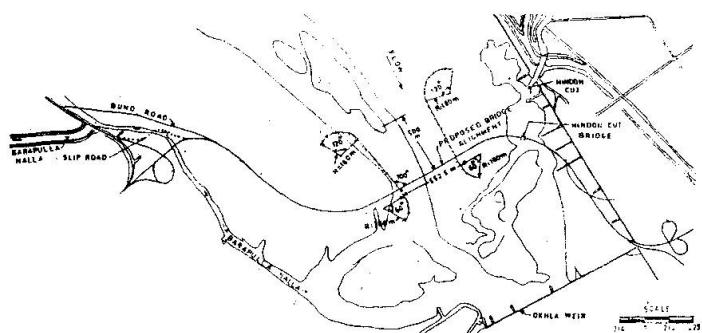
DELHI NOIDA BRIDGE SITE PLAN
